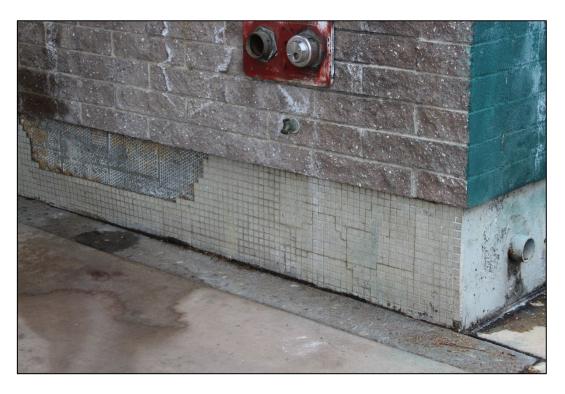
Detail of the cladding materials at the west corner of 887 Fulton Street, facing east (Stantec, 2025).
